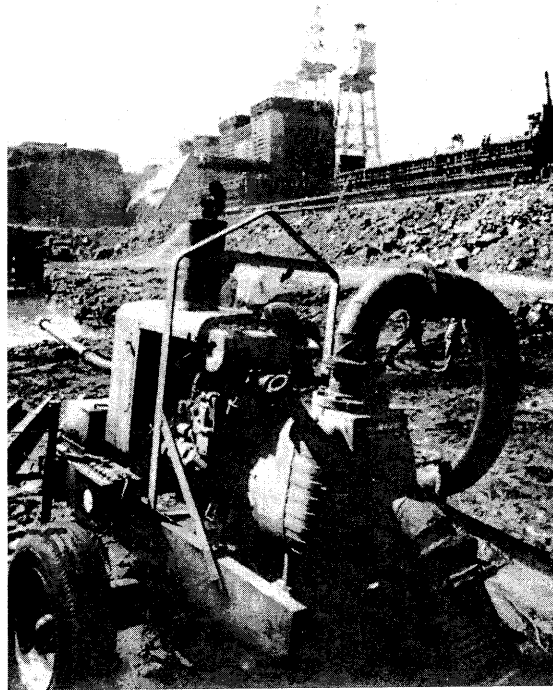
Stow's CP-20H 2-in. centrifugal trash pump. (Courtesy of STOW Construction Equipment)
